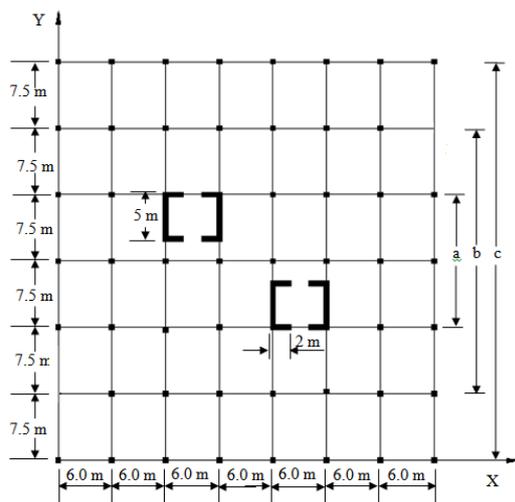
Typical floor plan for the buildings (element sizes not to scale)
